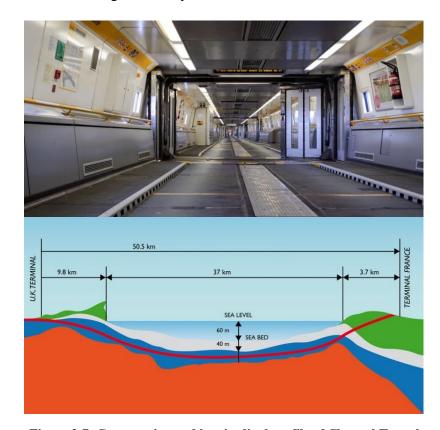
Cross section and longitudinal profile of Channel Tunnel
